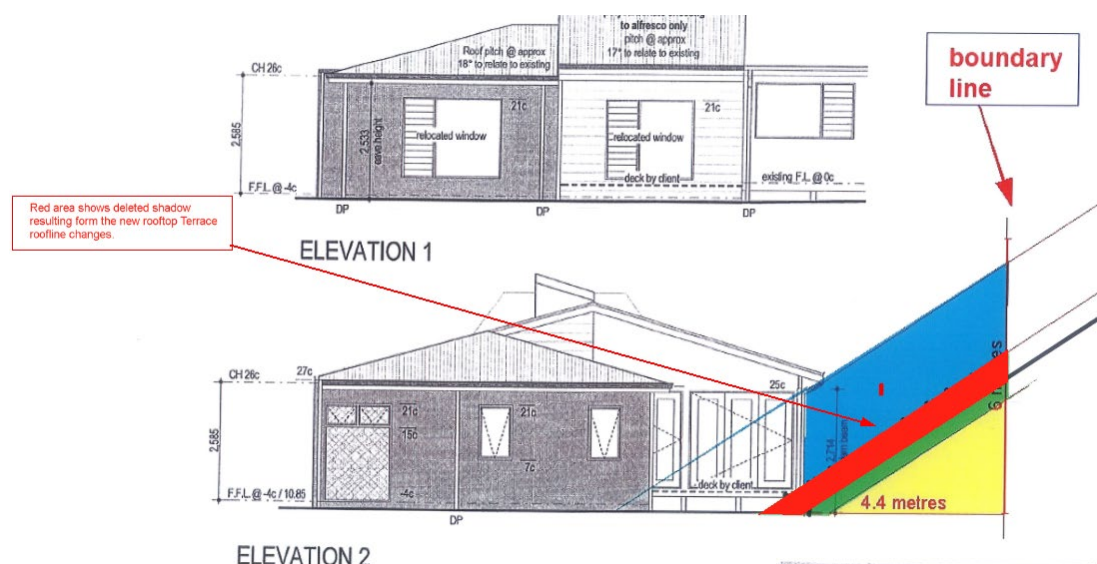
Diagram illustrating shadow impact of proposed development upon adjoining southern dwelling (No. 10 Hickory – east elevation shown above). The area shaded red demonstrates the reduction in extent of overshadowing due to changed roof pitch and form.
